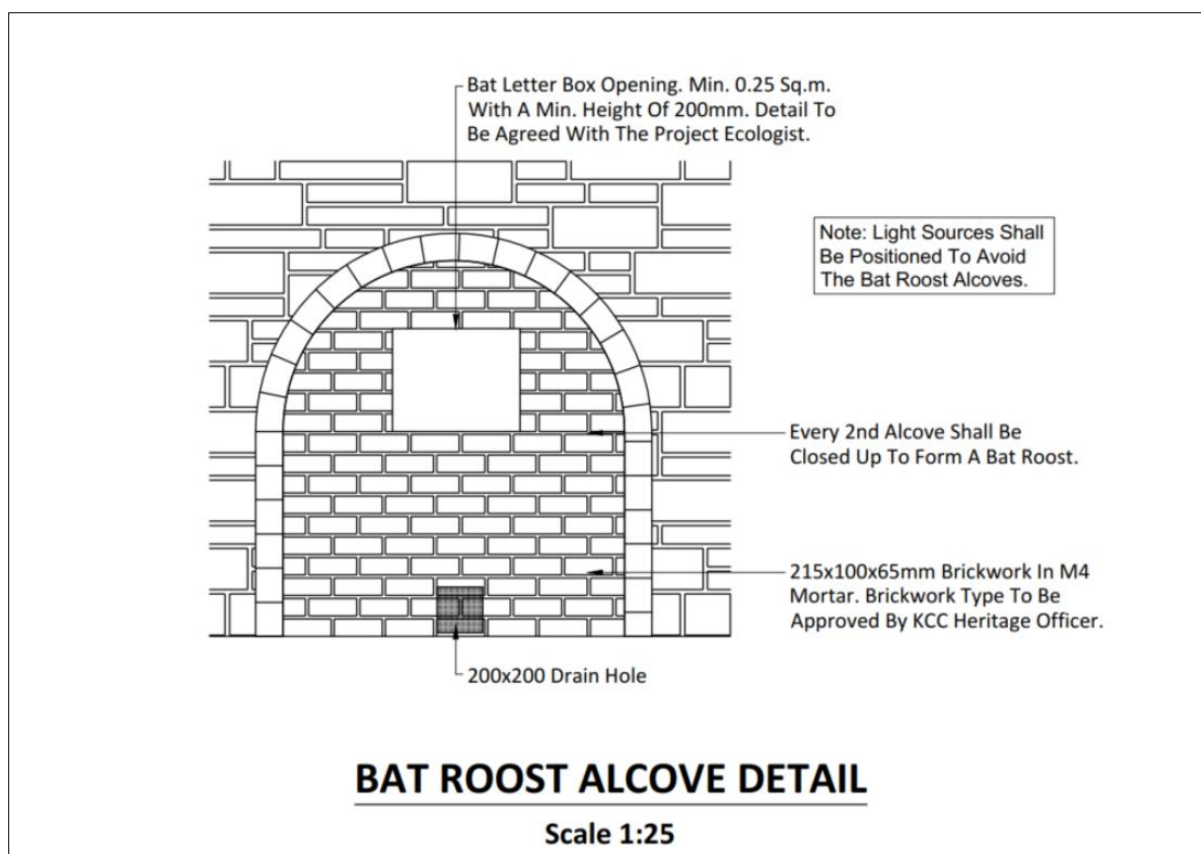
Proposed Works on Bat Roost Alcoves in Drung Hill Tunnels
